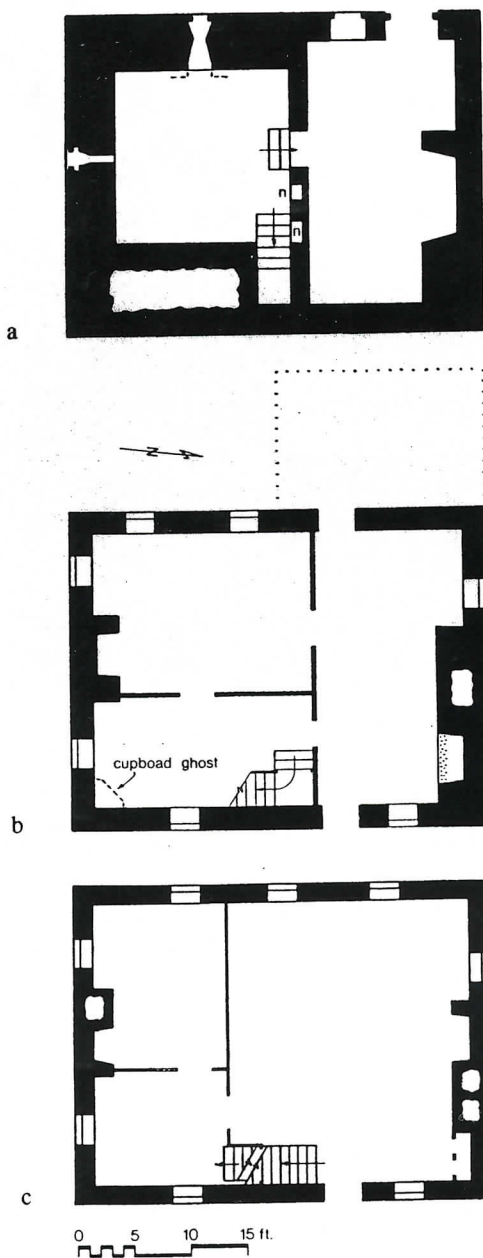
Cellar, first-, and second-floor plans of Fort Stover (From 1940 HABS plans.)
